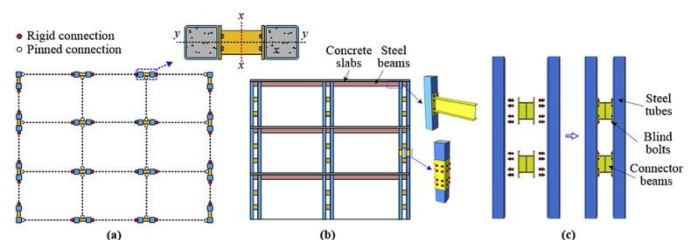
Typical representation of CCC frame: (a) plan view; (b) elevation view; and (c) assembly of CCC.
